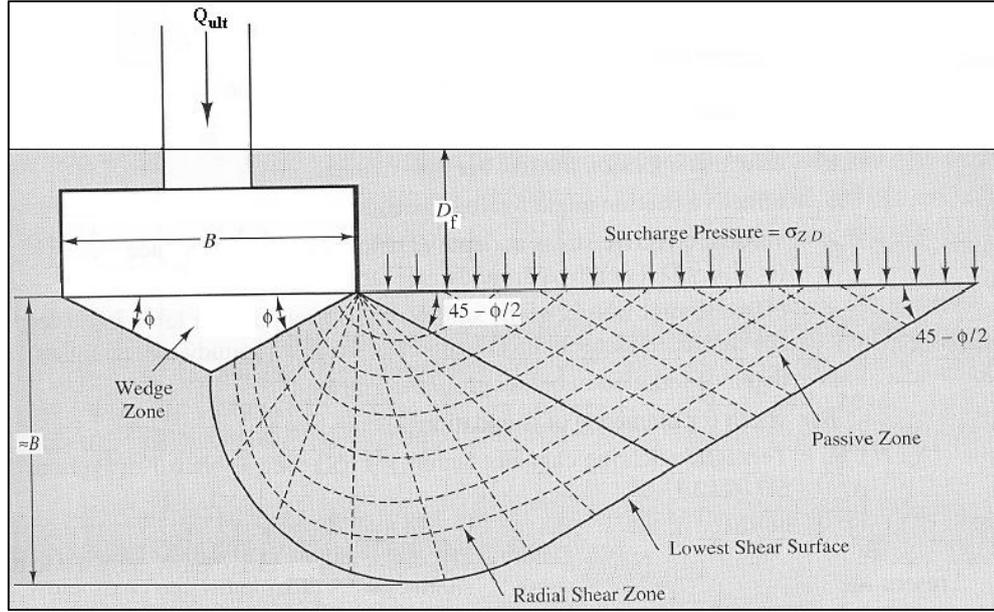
Failure surface in soil for a continuous rough rigid foundation as assumed by Terzaghi (Das, 1999).
